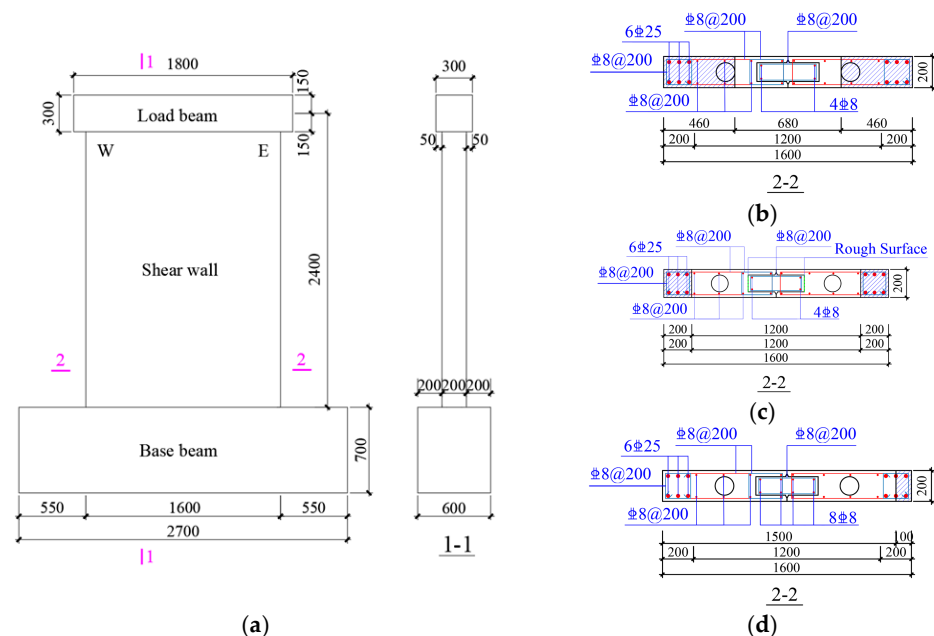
Section dimensions and reinforcing details. Note: The shadow part represents the defect area. (a) Elevation drawing of specimen. (b) Cross-section of PSW1. (c) Cross-section of PSW2. (d) Cross-section of PSW3.
